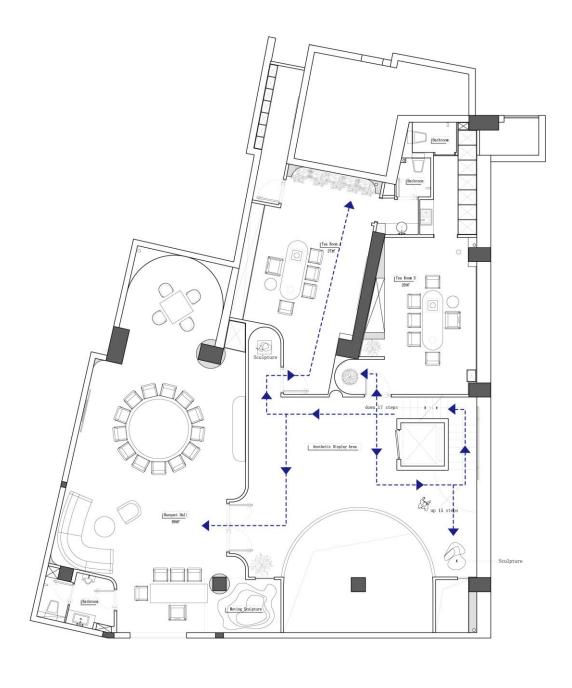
Layout Plan of the First Floor, Mengjiahao Tea Space
